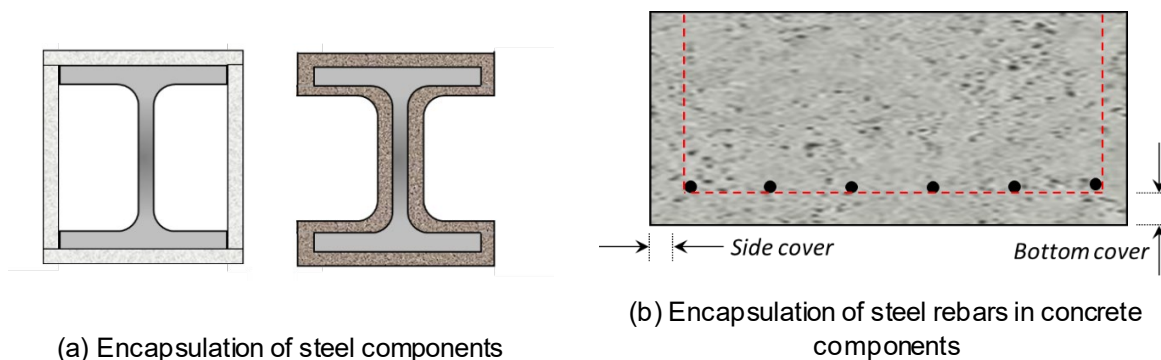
Examples of encapsulation methods for structural steel and concrete components.
